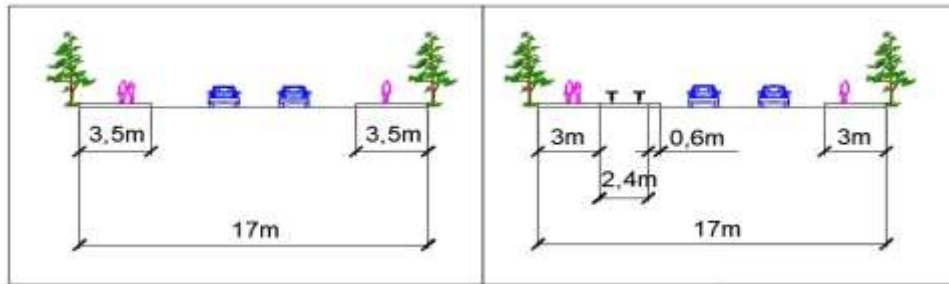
Route-1 (Type-1) current cross-section and designed cross-section
